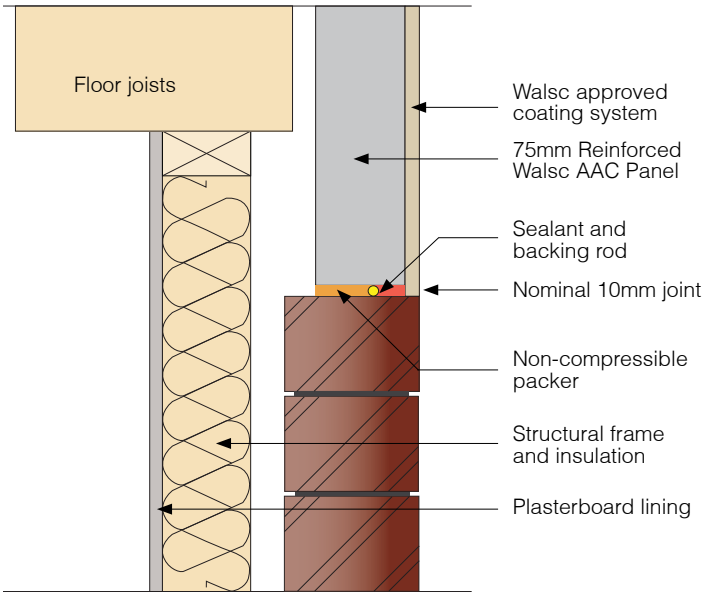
Conjunction detail between AAC Panel and Brick Veneer 2
